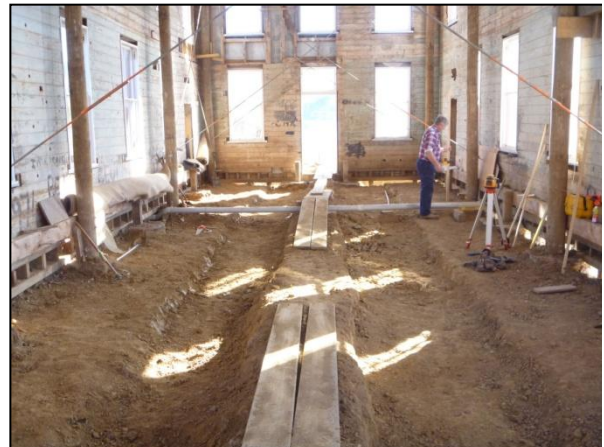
Sub-floor lowered for new bearers, joists and crawl space (12 June 2015).
